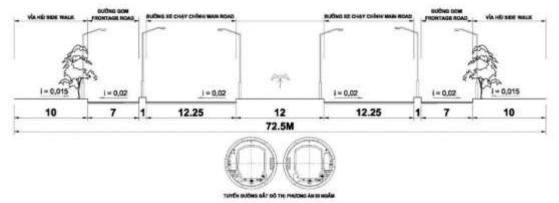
Cross-section of TC18 Road Section Inside Line 2.3 Area
